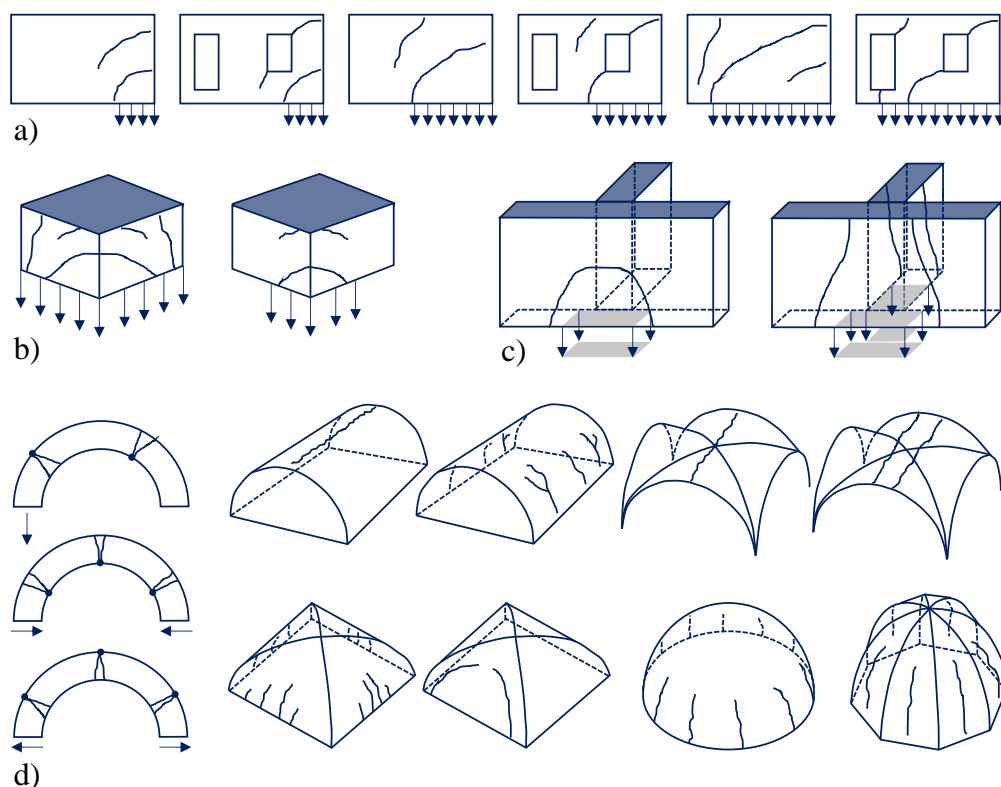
Typical damage patterns for masonry structures subjected to settlements: (a) Façade with and without openings; (b) buildings corner connections; (c) T-connections; (d) arches, vaults and domes.
